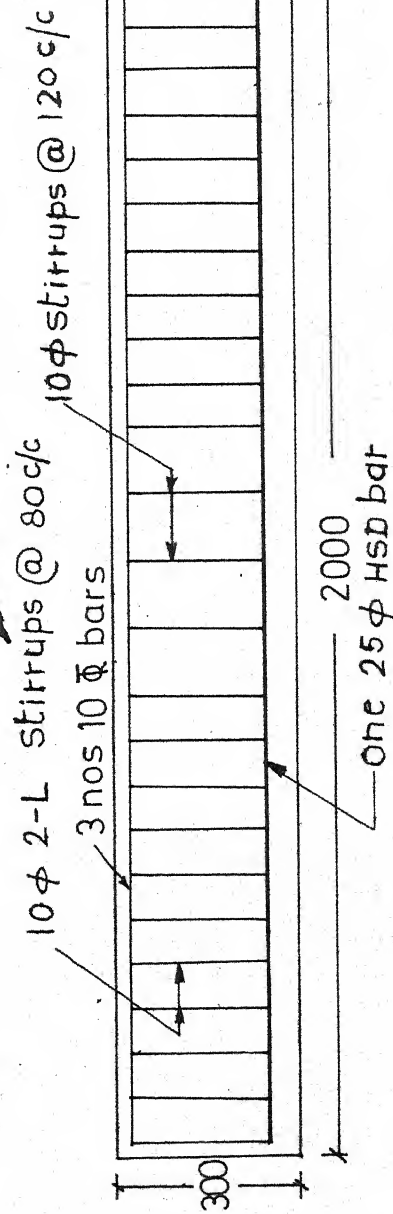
REINFORCEMENT DETAILS OF HINGED BEAM
